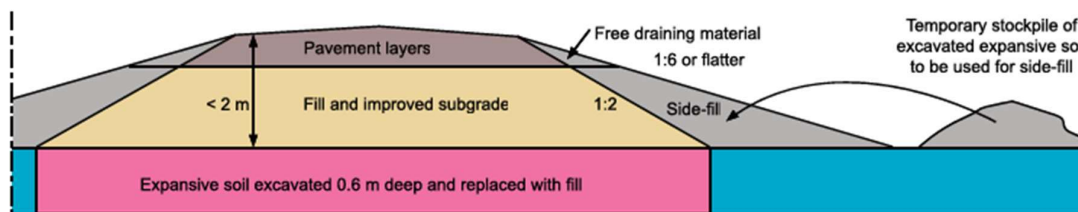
Construction on expansive soils (embankment height < 2m) [11]
